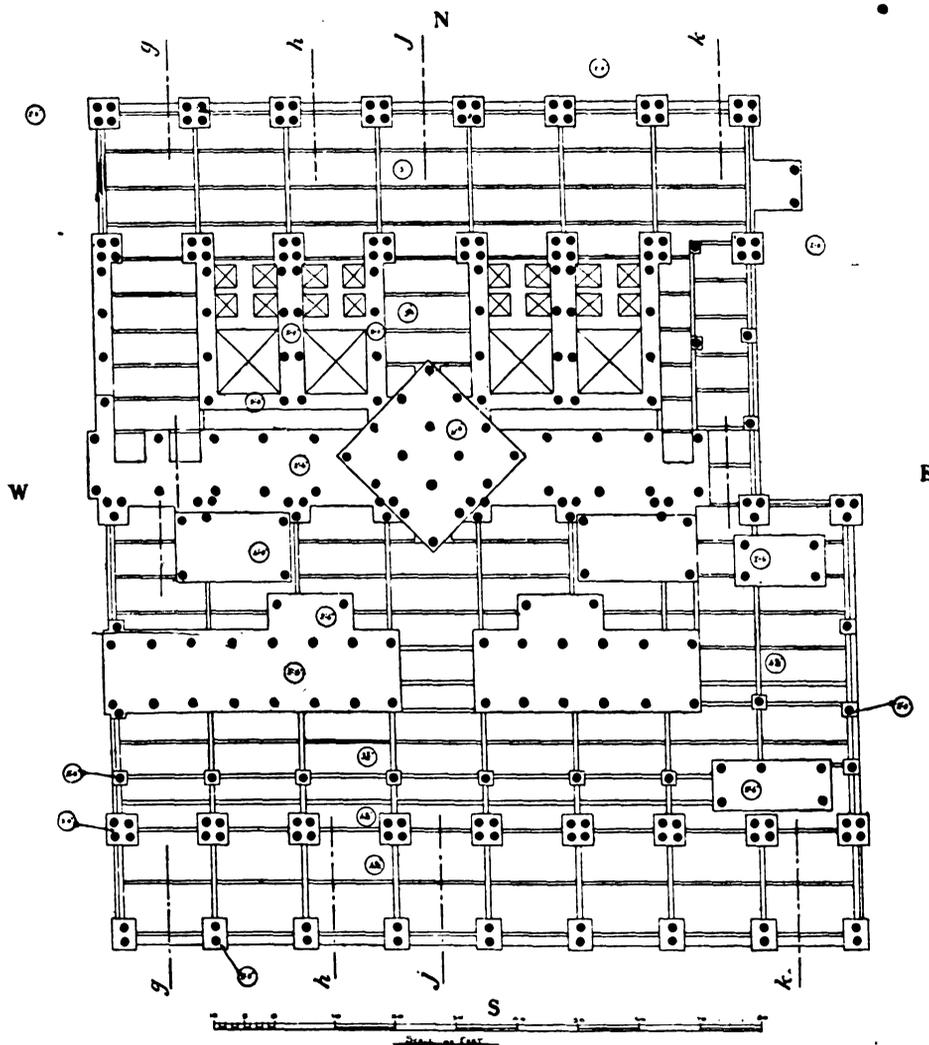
REINFORCED CONCRETE FOUNDATION OF STATION.
